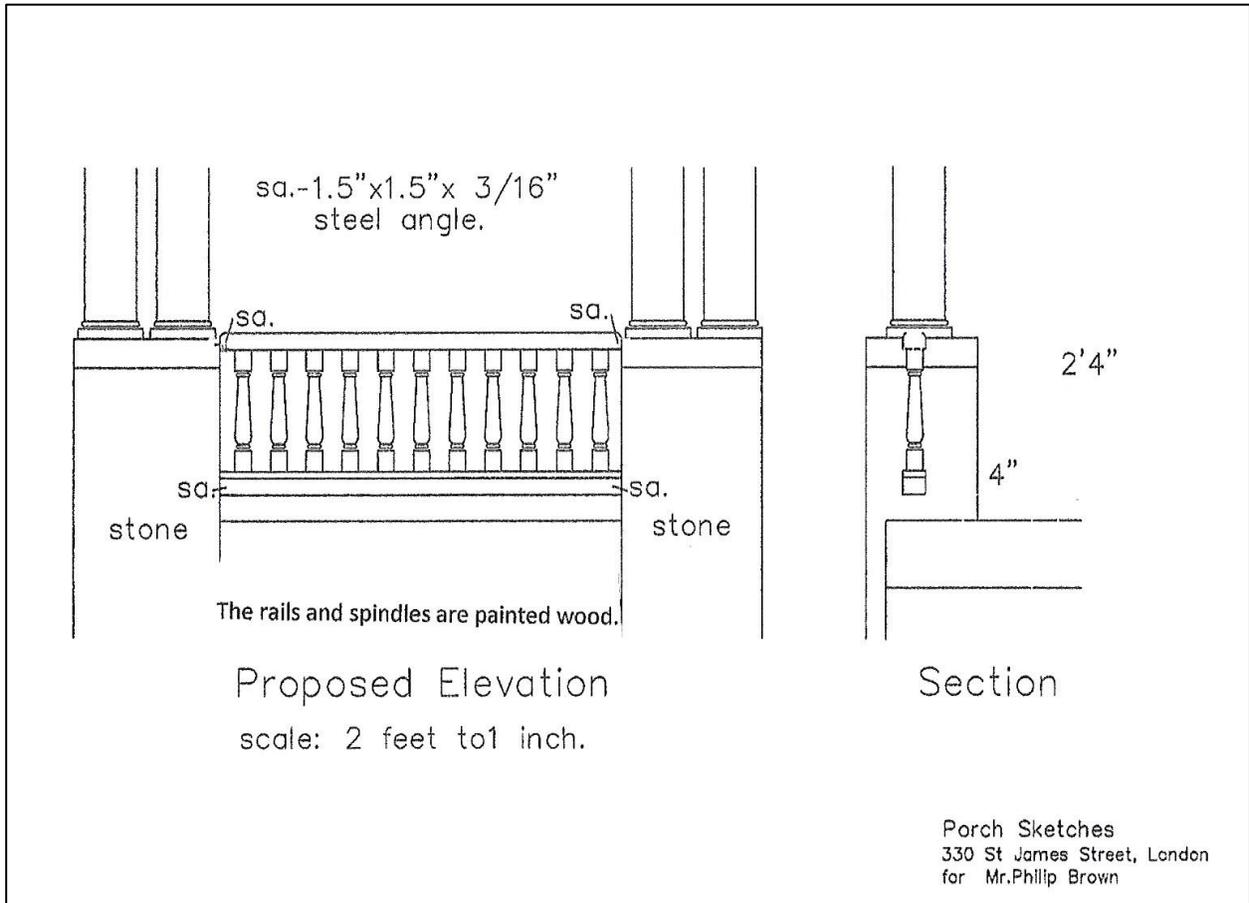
Drawing, submitted as part of this Heritage Alteration Permit application (HAP21-039-L), showing the proposed railing affixed to the existing piers with turned spindles set between top and bottom rails and made of painted wood.
